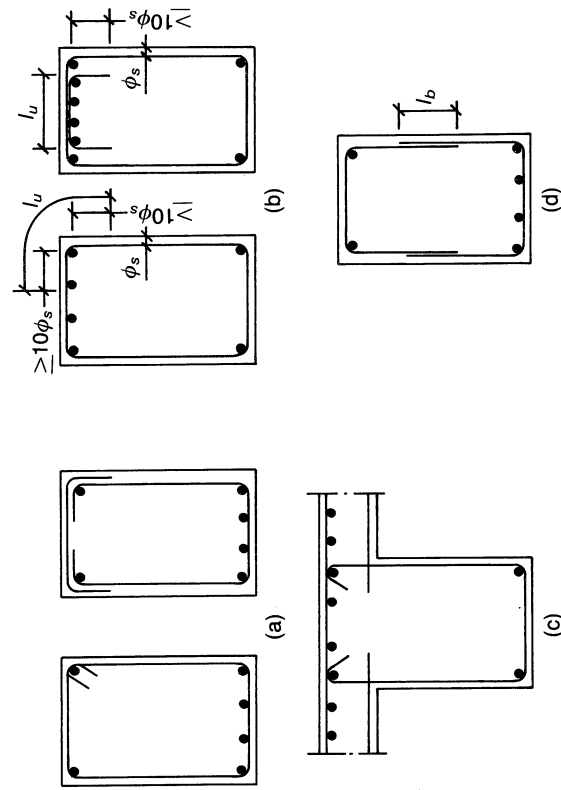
Possible layout of stirrups: (a) closing in compression zone; (b) closing in tensile zone; (c) closing in compression zone; (d) this detail has been used but does require particularly good workmanship to achieve its design purpose
